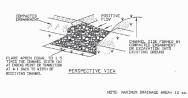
STONE DUTLET SEDIMENT TRAP - ST II
